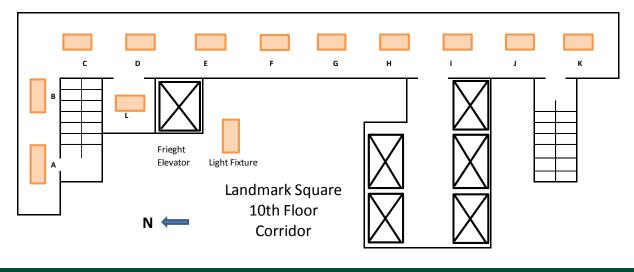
TENTH FLOOR CORRIDOR LIGHTING LAYOUT
